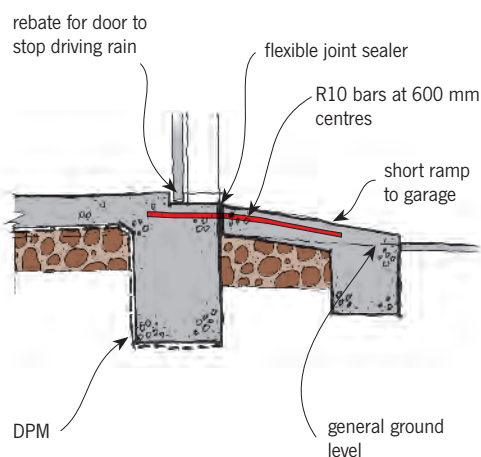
Garage entrance. (Reinforcing in footing not shown)
